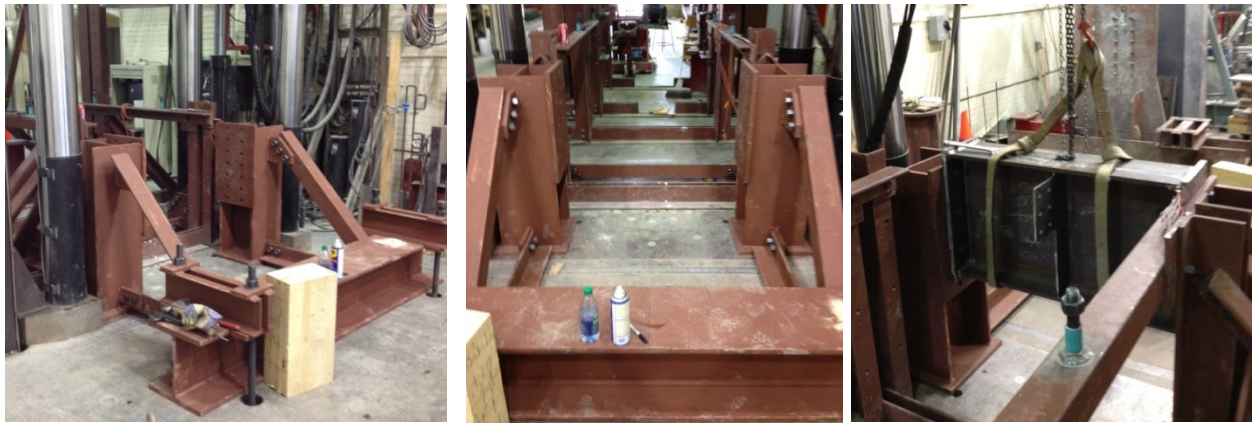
Beam-to-Column Reaction Frame with Stub Column Installed
